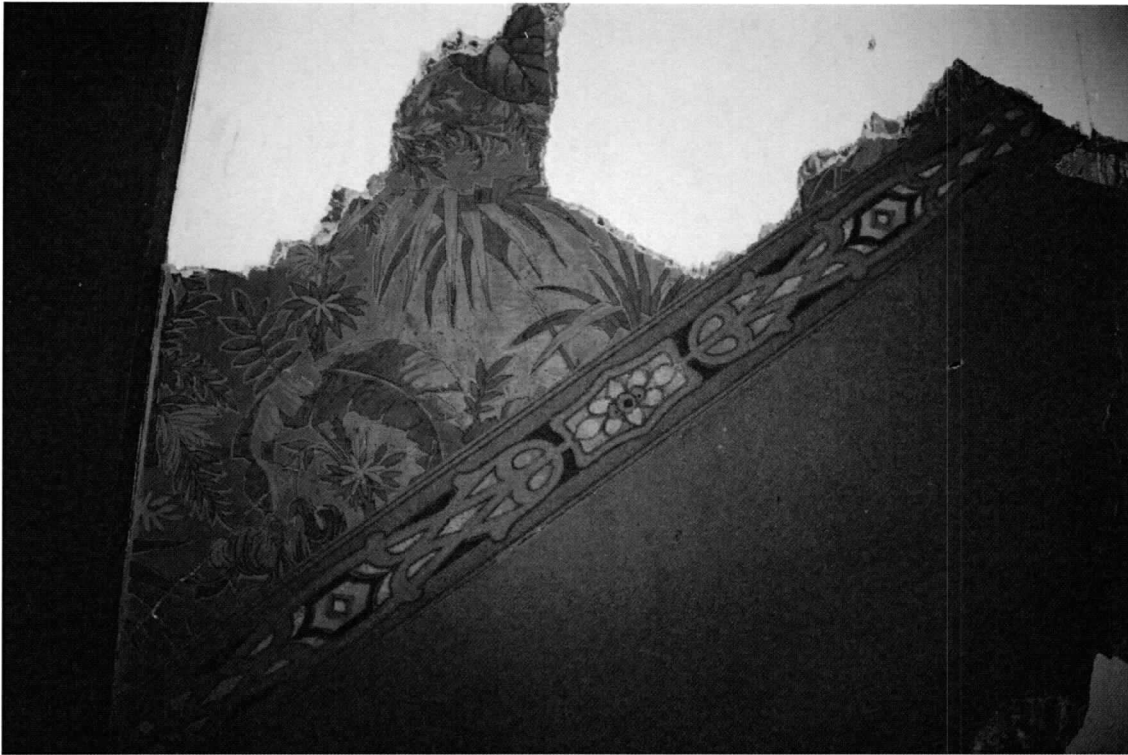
of 24: Passage wallpapers and dividing border on stairway. 11/16/2016
